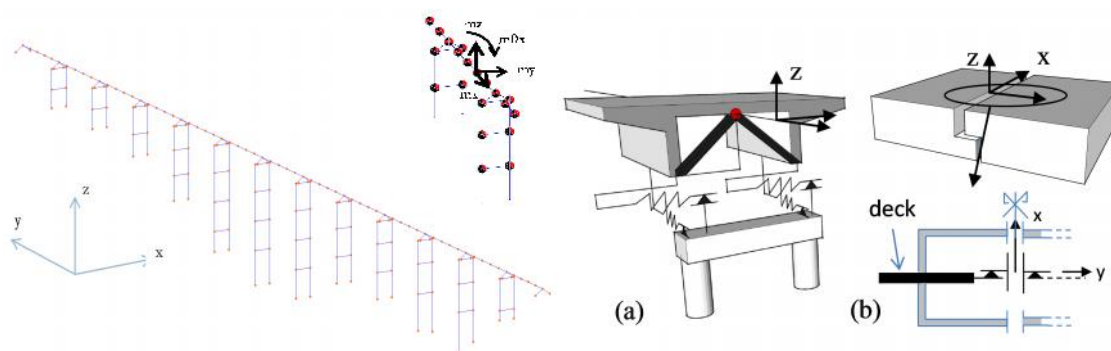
The OpenSEES model of one road-way of the Rio-Torto viaduct, (a) Pier-deck connection model (b) Gerber Saddle model
